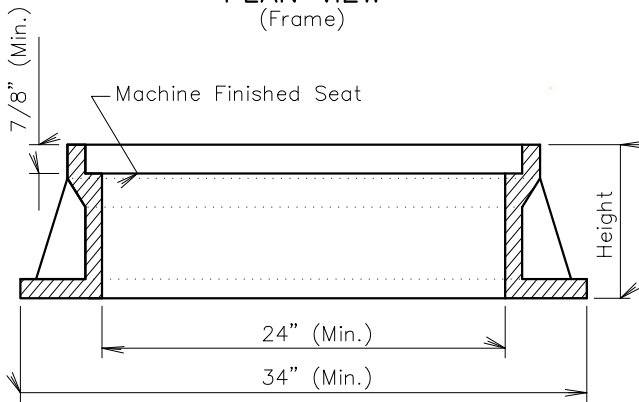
MANHOLE FRAME AND LID-TYPE A
